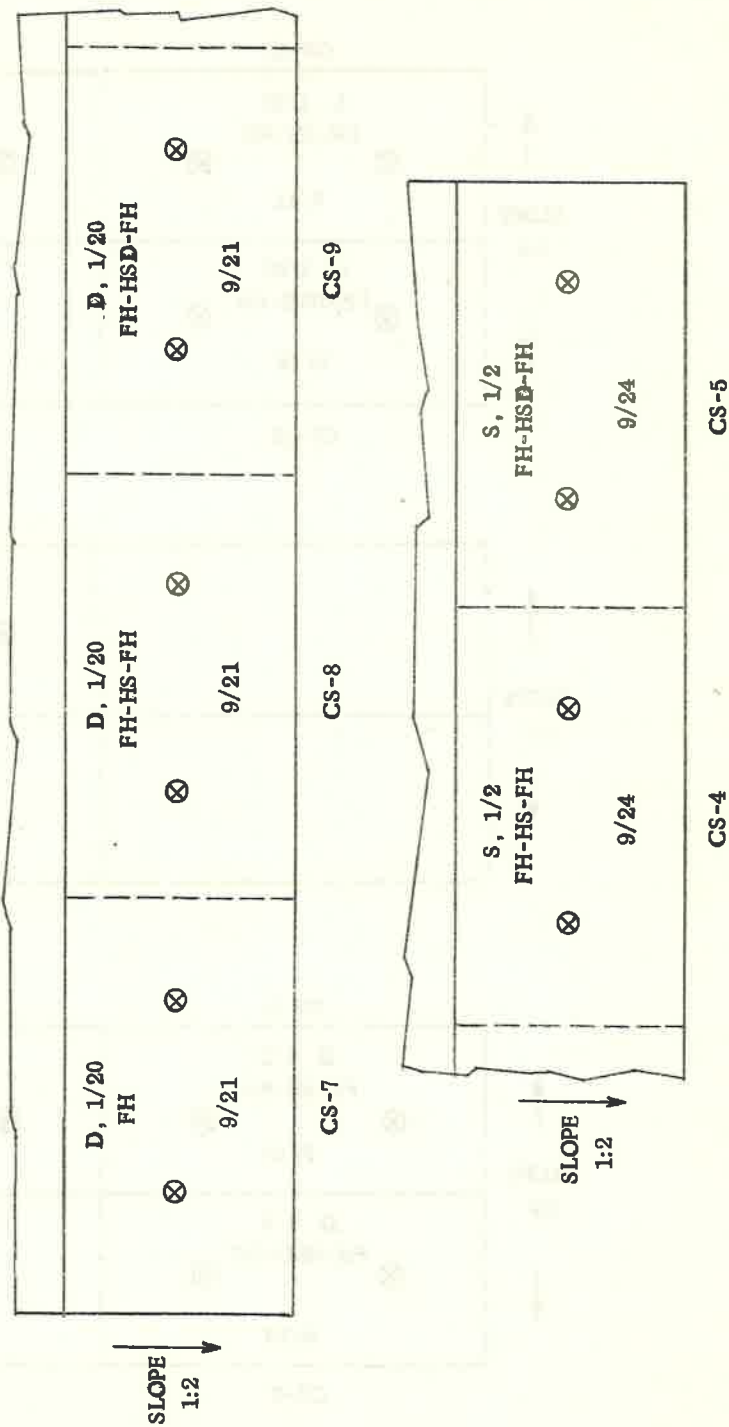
Layout of Composition Shingle Roof Test Areas
